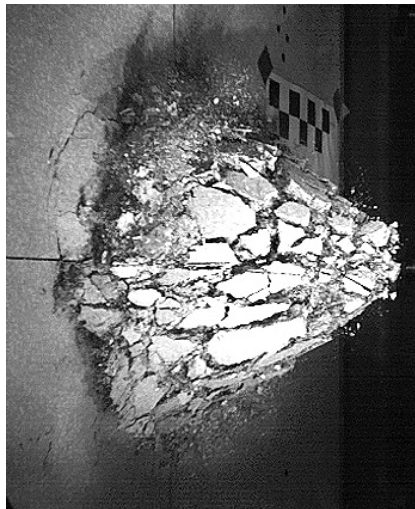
Secondary debris on the protective side of a concrete slab loaded by a contact detonation
